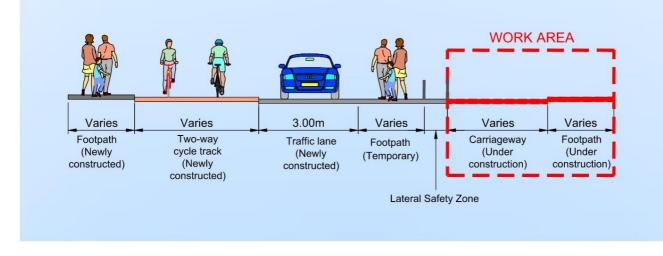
Traffic Management Cross Section, Section 5g – Stage 2
